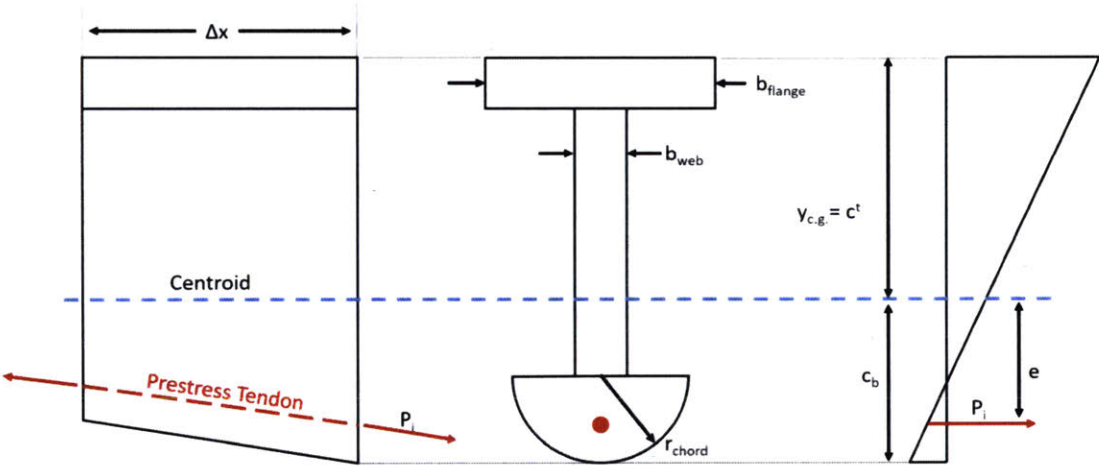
Cross Section with Prestressing tendon highlighted.
